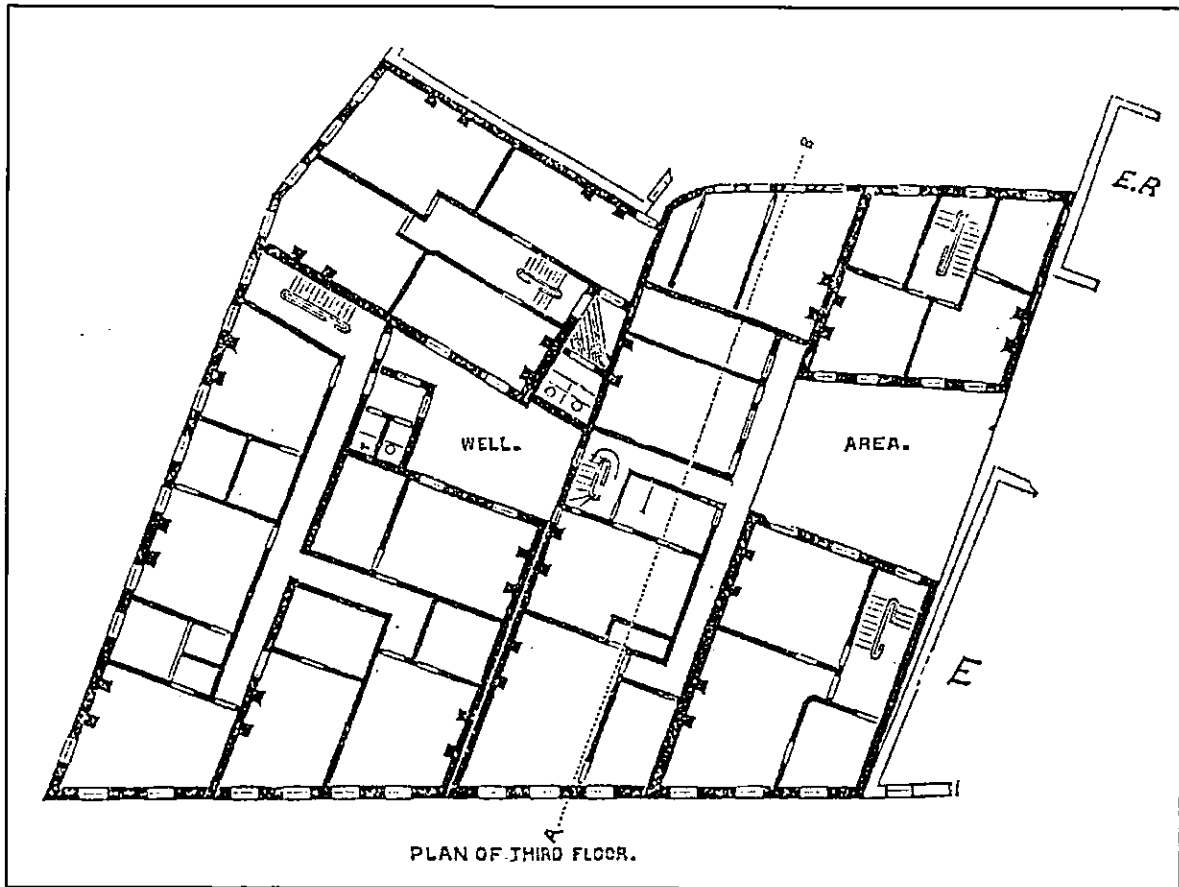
Tenement floor plan (DeForest and Veiller 1970).
